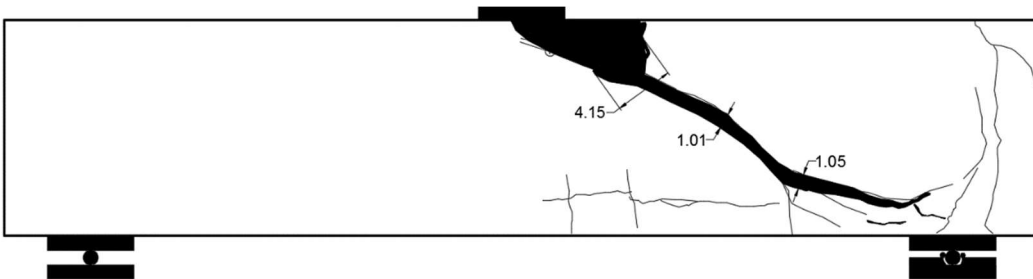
Crack pattern at failure for SNFRC 0.5% beam #6
